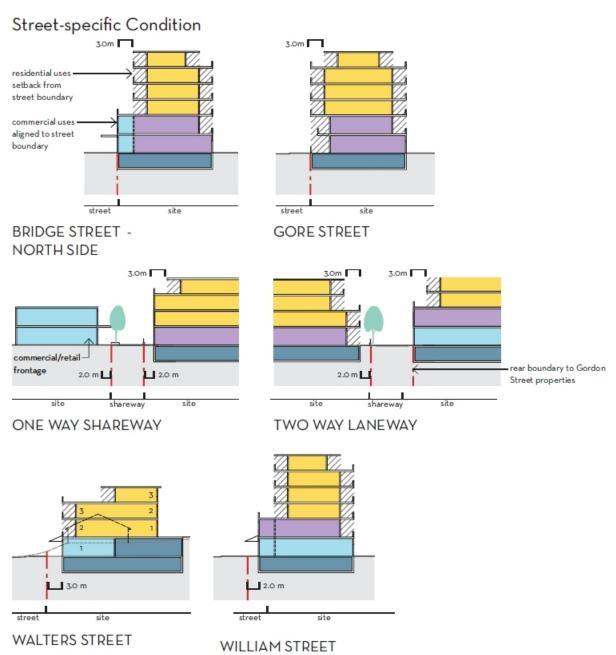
Building envelope sections showing place specific variation to street edge alignment
